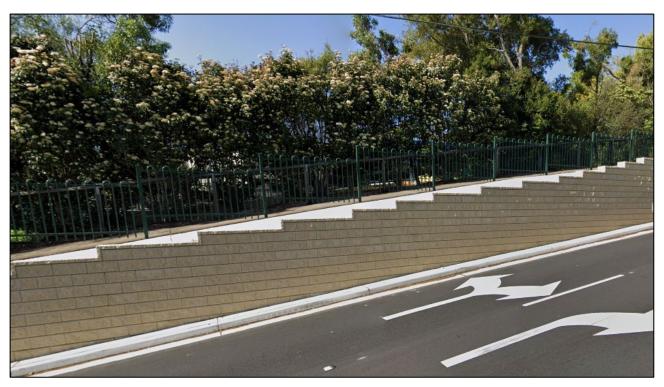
Roadside retaining wall Glenhaven Road, The Hills Shire
